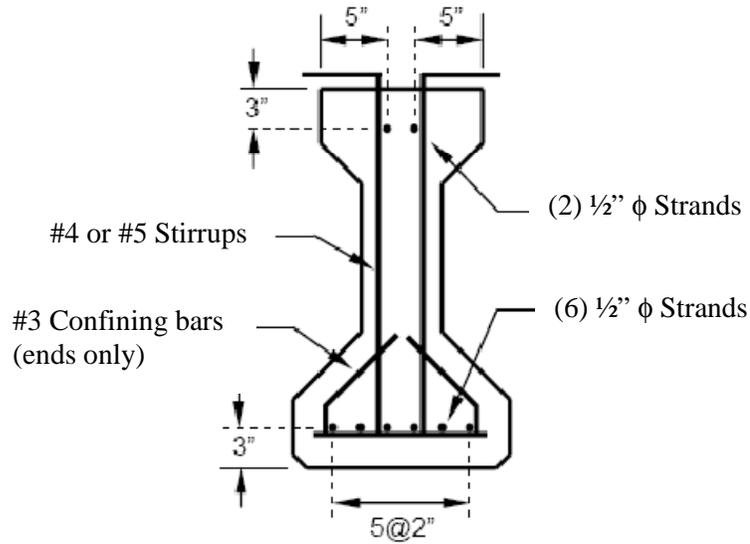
Prestressed AASHTO Type I Girder Cross Section
